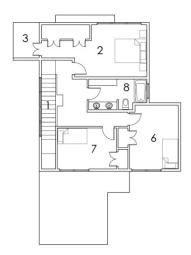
Second Floor Plan - 1. Stair 2. Master Bedroom 3. Deck 6. Bathroom 7. Jeremiah's Bedroom 8. Spirit's Bedroom
